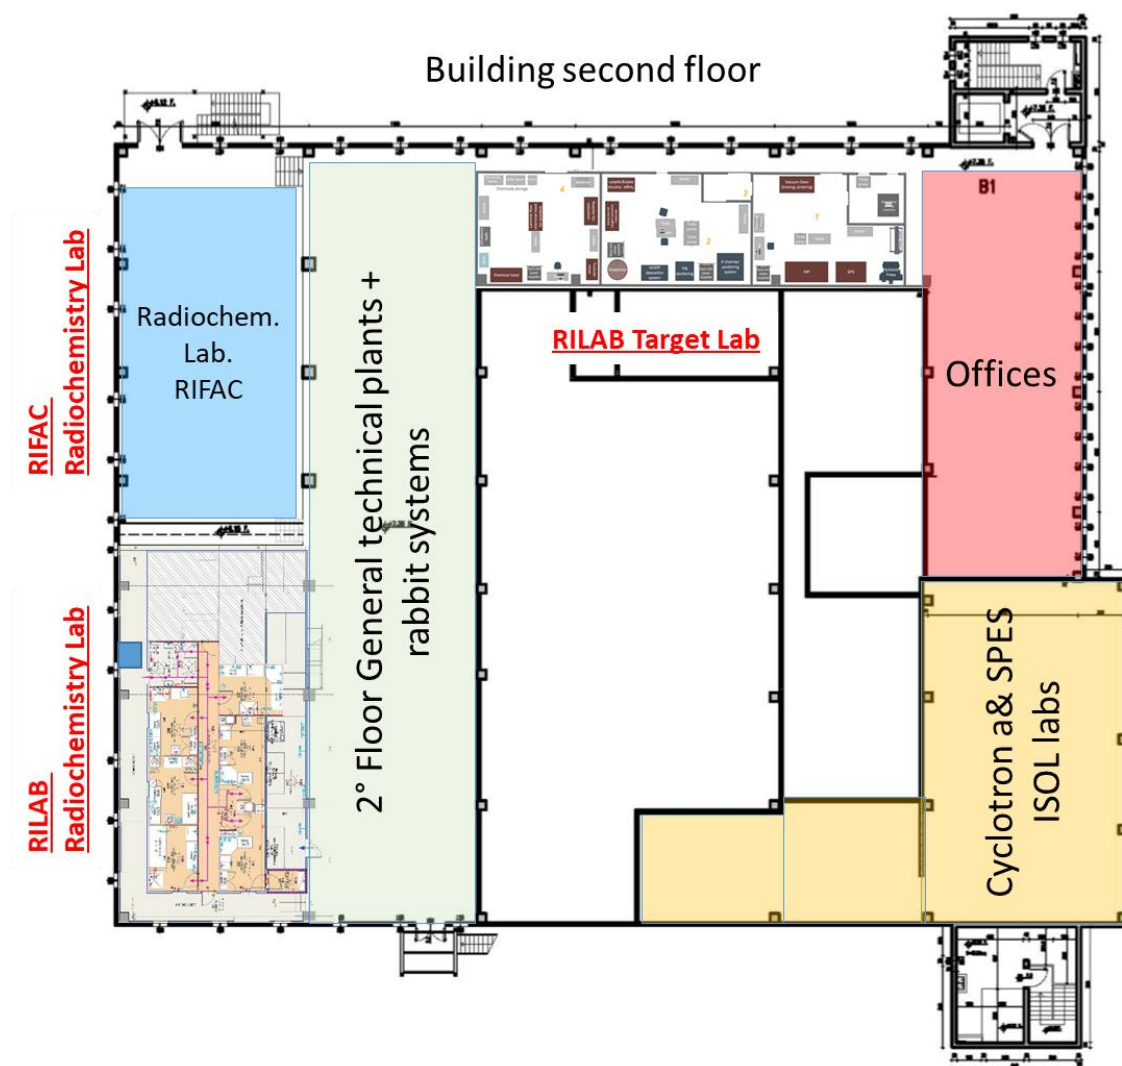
Layout of the LARAMED laboratories at the second floor of the SPES building
